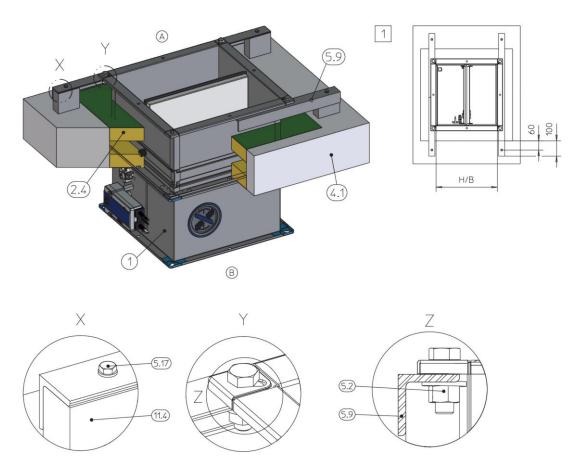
Dry mortarless installation into a solid ceiling slab, with a fire batt, suspended
